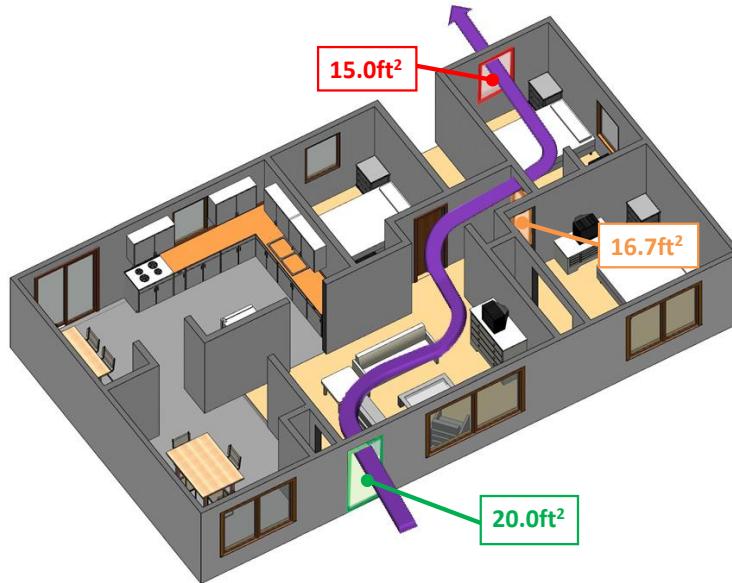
Opening Sizes - Single Story Ranch Structure
